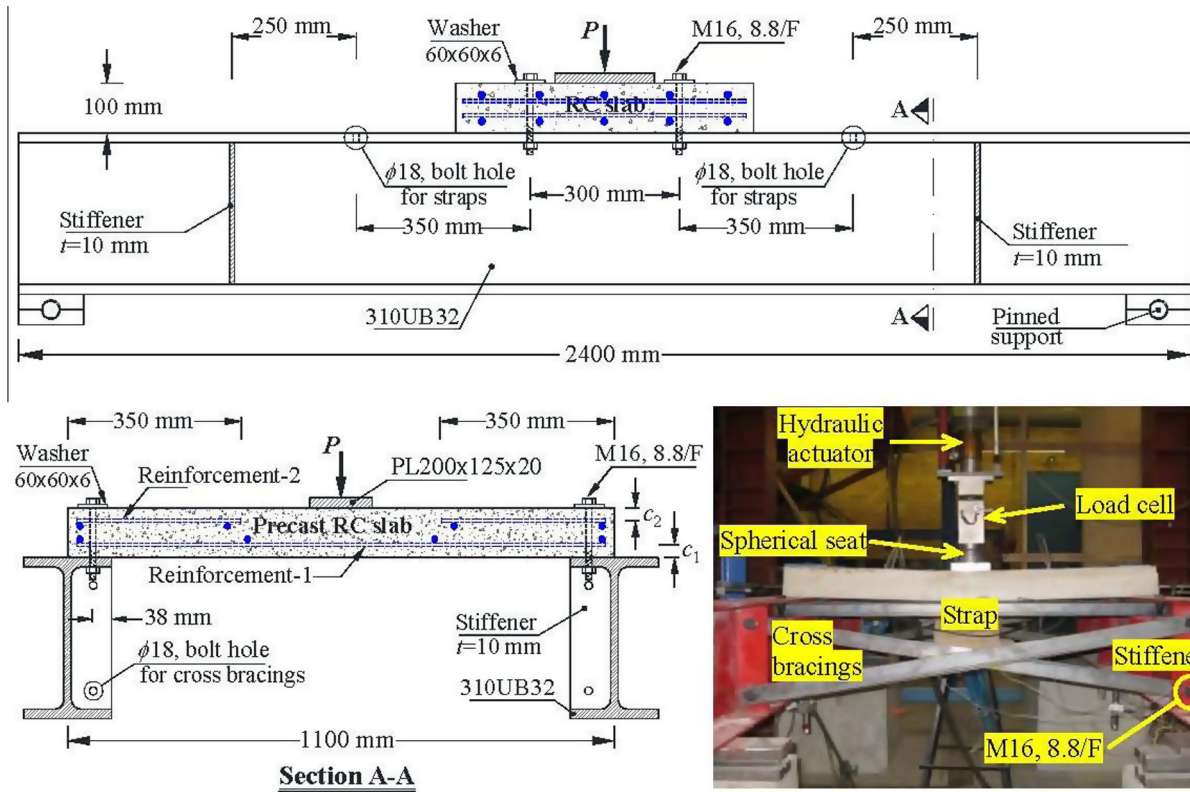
Geometry, cross-section, configuration of restraining/confining system in transverse direction and test set up for precast RC slabs connected to steel girders using PFBSCs.
